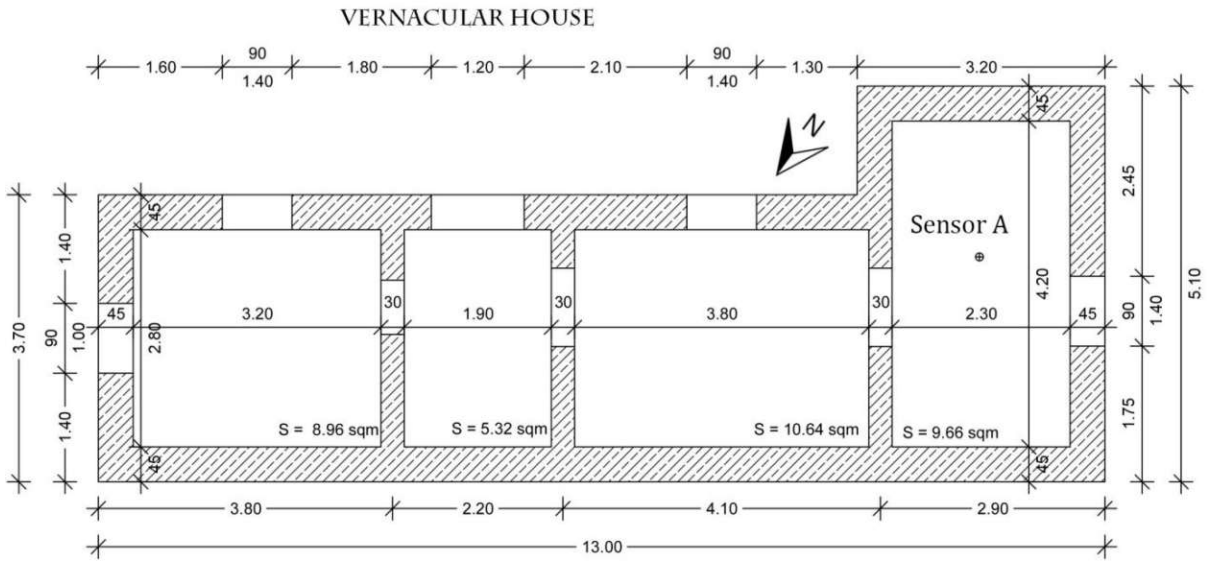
Floor plan of the analyzed traditional house with sensor positioning
